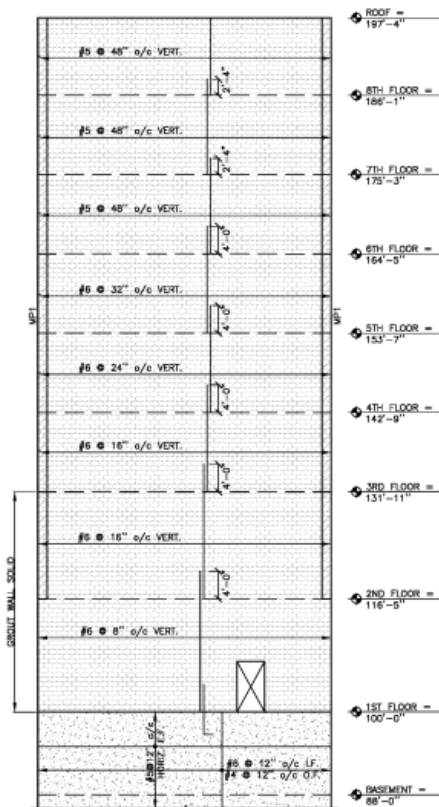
Masonry Shear Wall (S10.3 Drawing 2)
